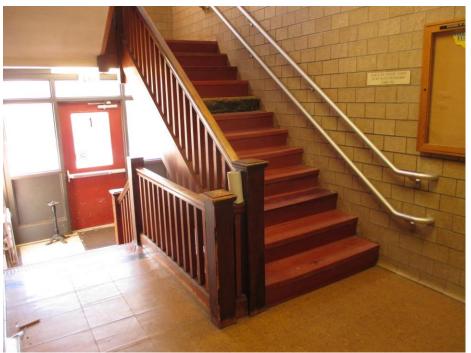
Interior stair at first floor within the Sainte Chrétienne Academy.
